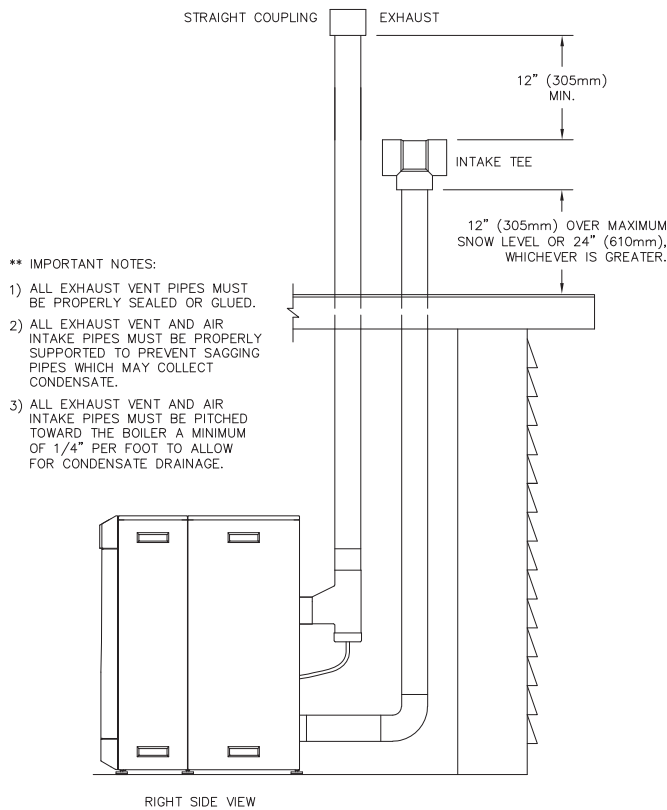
Vertical Exhaust and Air Inlet Pipe
